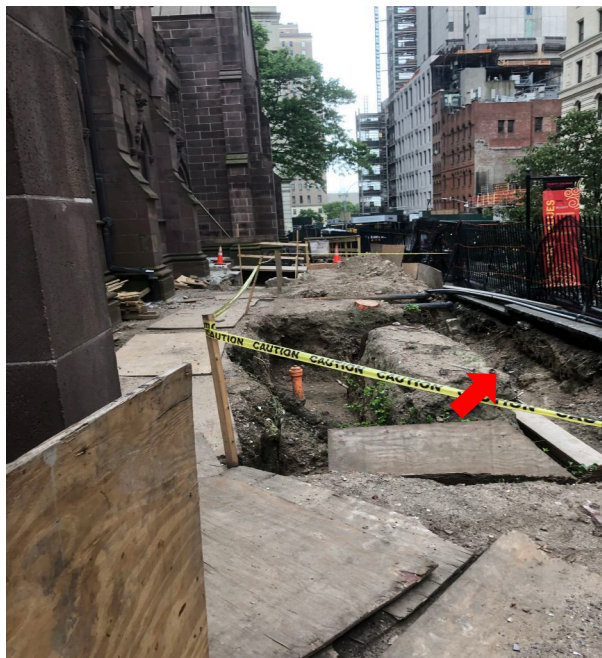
Looking south along the NW Drainage Trench (arrow) on 6/10/21 when excavation and oversight resumed after the Covid-19 stoppage. Excavation occurred east of the drainage trench prior to the work stoppage with the excavated soil stockpiled for screening. (C. Xanthis 6/10/2020)
